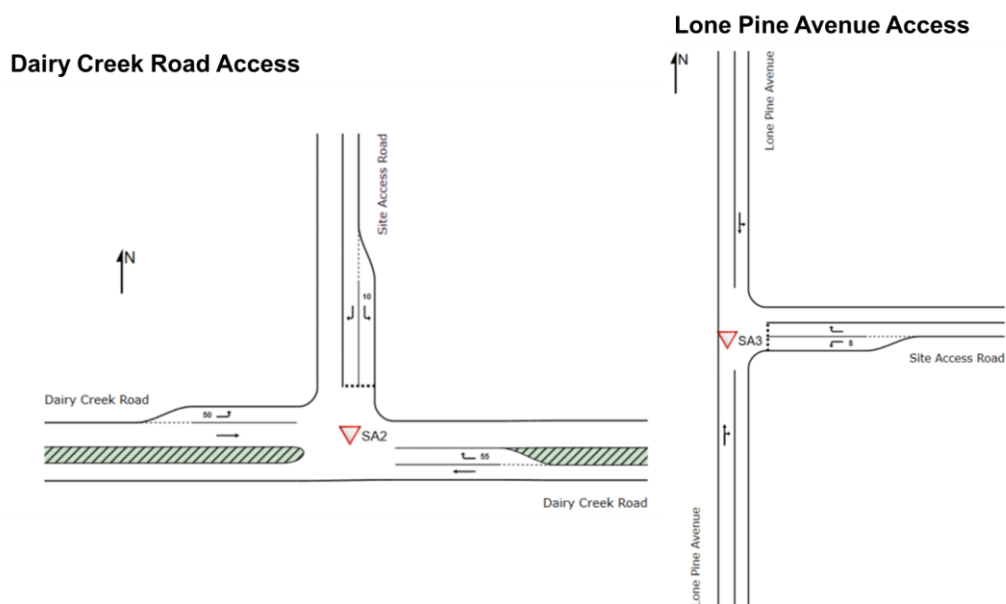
Dairy Creek Road and Lone Pine Avenue access layouts
